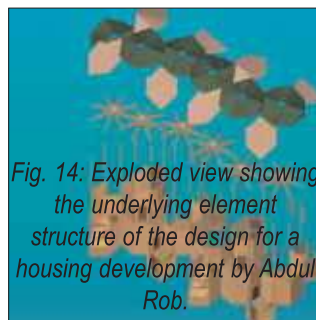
Exploded view showing the underlying element structure of the design for a housing development by Abdul Rob.
